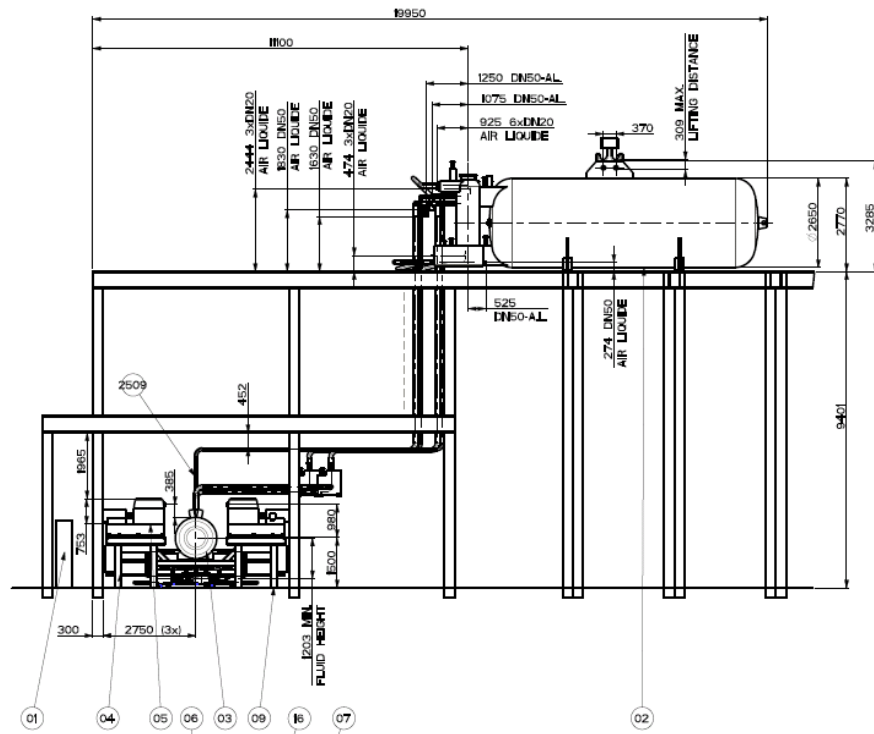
Elevation view of of the pipeline system set up connecting pumps with cylindrical tanks
